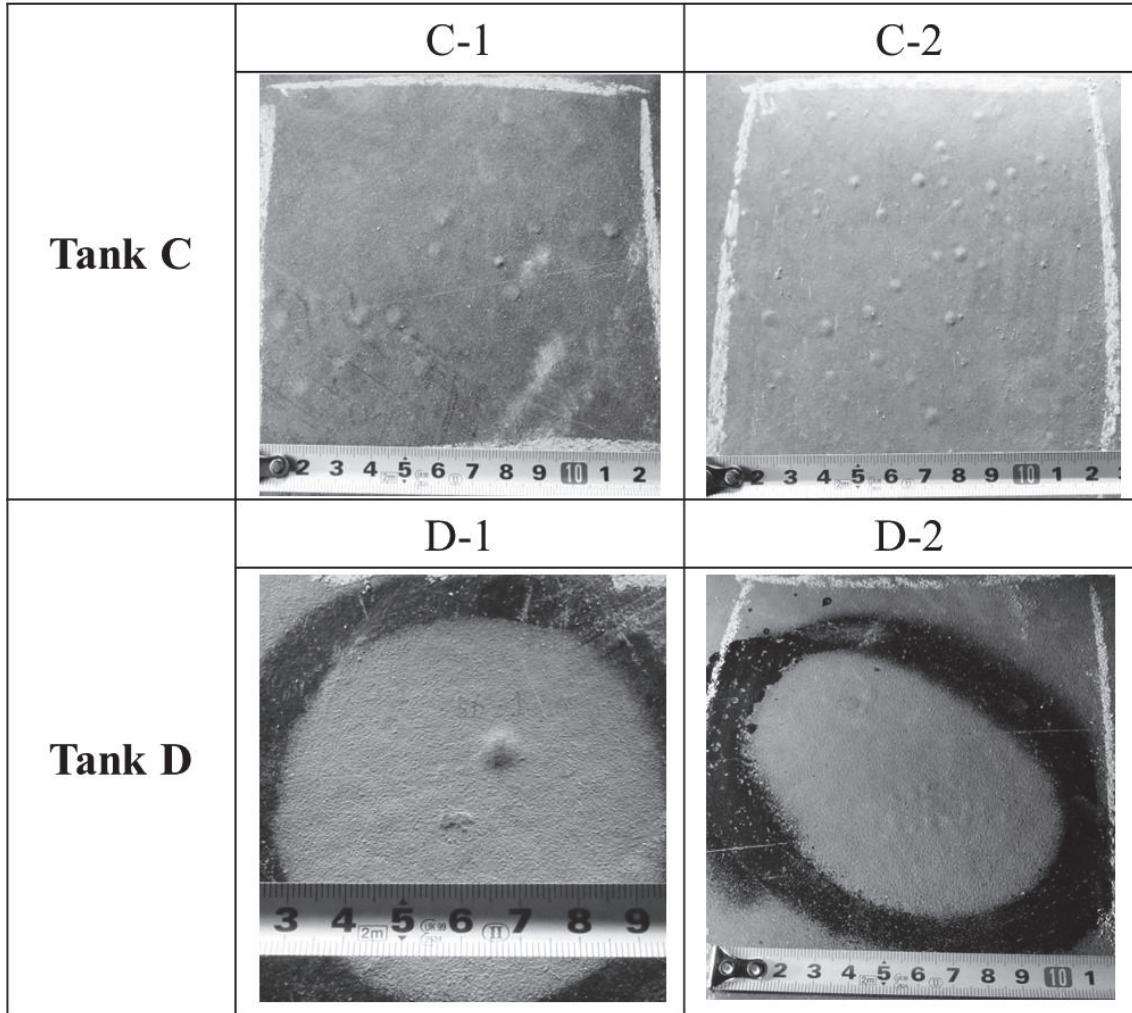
Surface conditions of blistering coatings in actual oil storage tanks.
